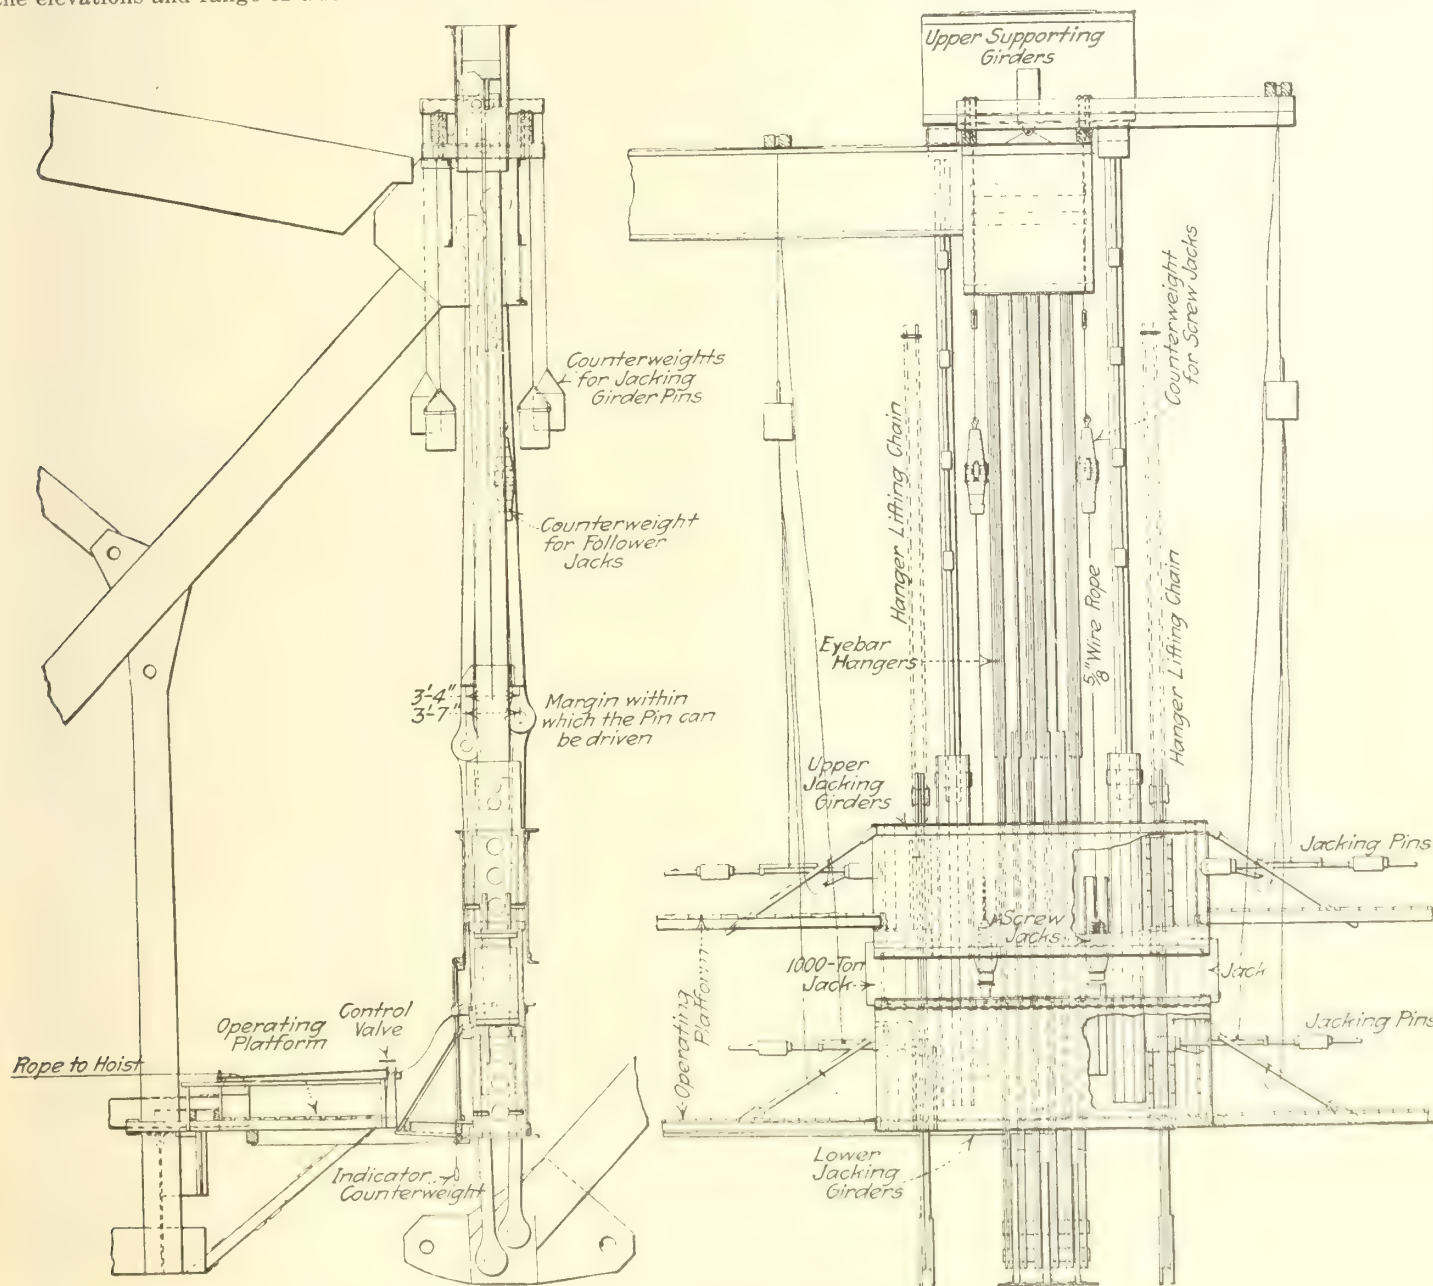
Jacking equipment for hoisting suspended span, Quebec Bridge.
